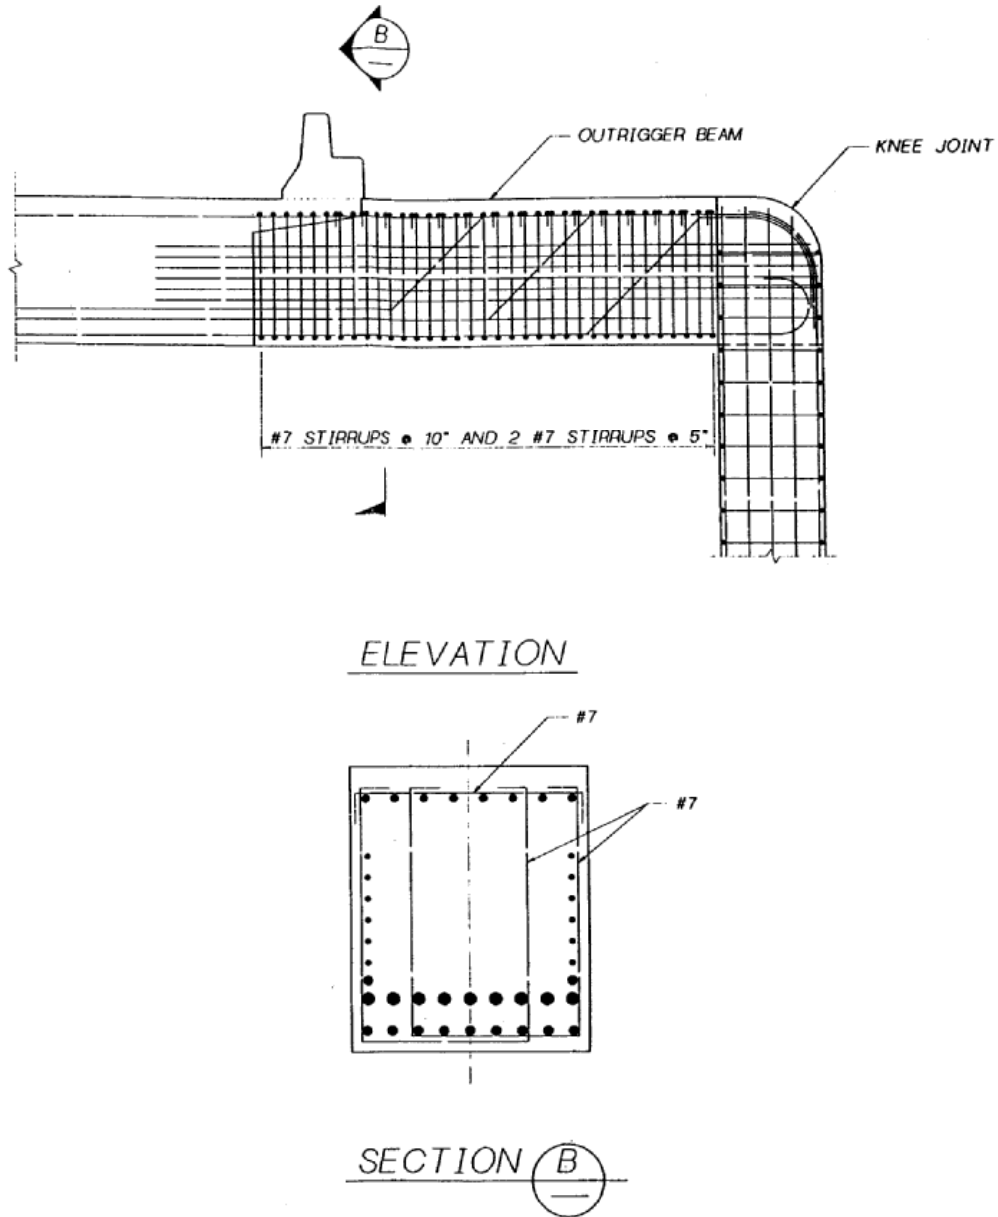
A Typical Reinforcement Layout for an Outrigger Bent (Adapted from Zhang et al., 1996)
